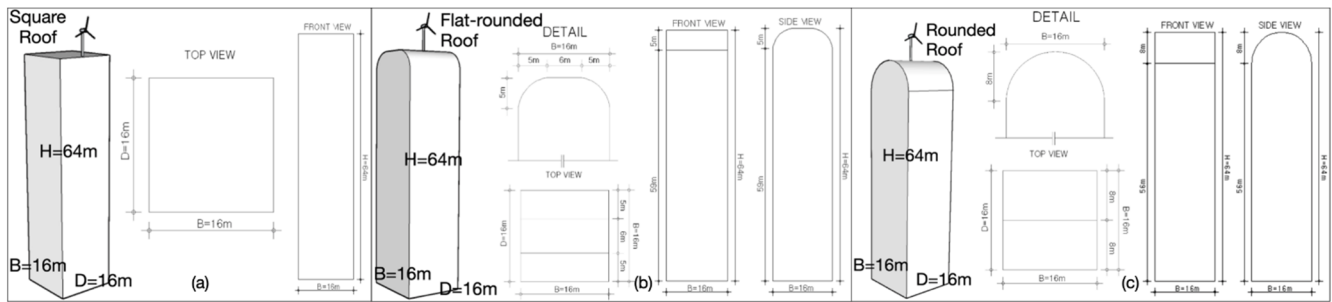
Detailed geometry of the building models (scale 1:150) used for the experiments: (a) square roof building A, (b) rounded-corner roof building B, and (c) round roof building C.
